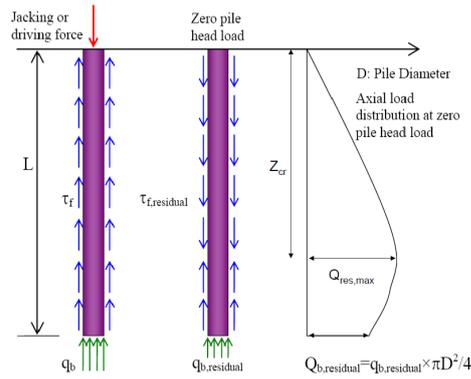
(1) Compression force on the pile (hammering/jacking) (2) Resulting residual stresses after removal of compression load on pile head (3) Axial load distribution of situation no.2 (Xu, 2007)
